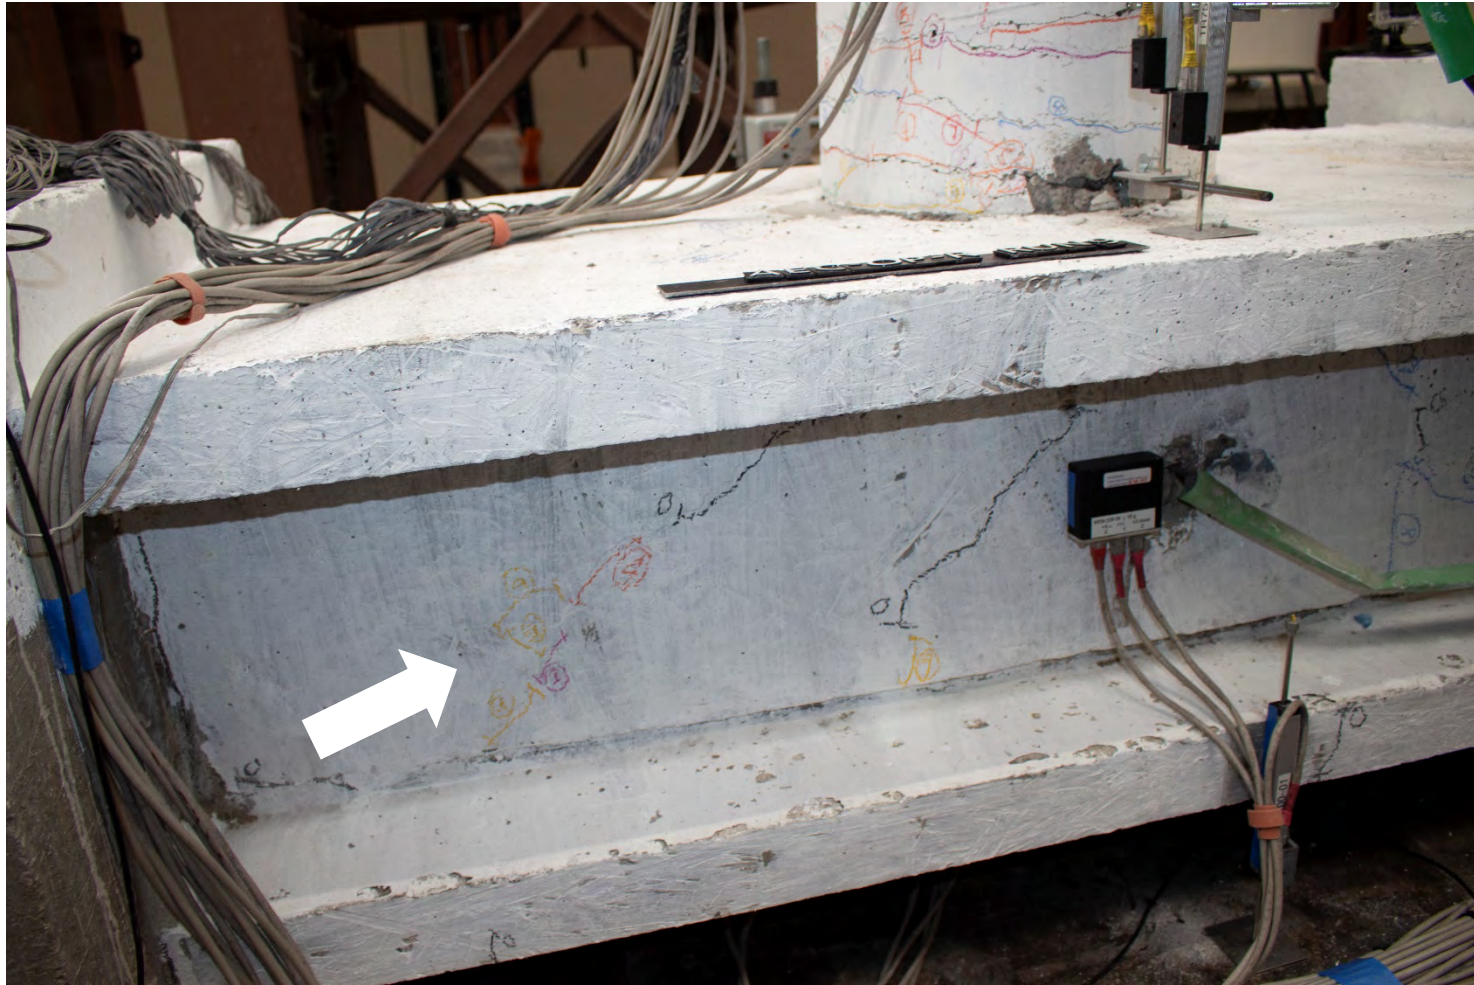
Shear crack in the cap beam web (run #9)
